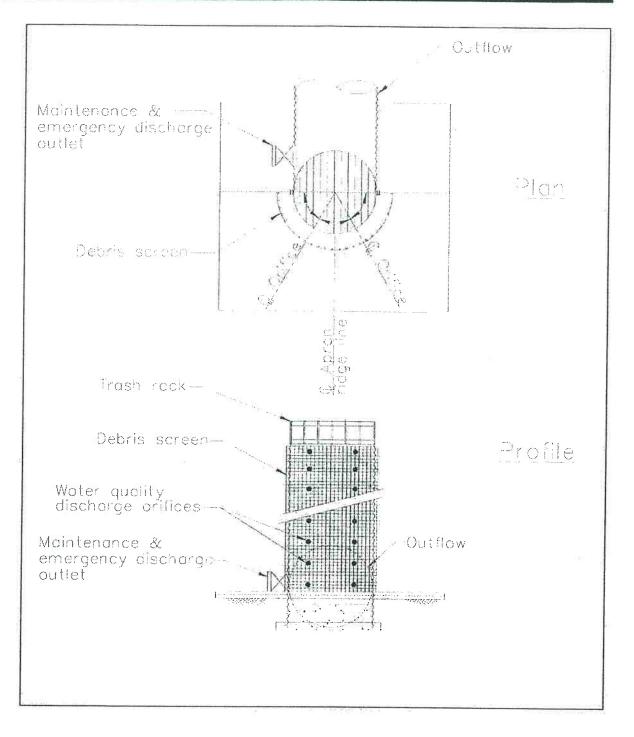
MULTIPLE ORIFICE OUTLET RISER NOT TO SCALE
